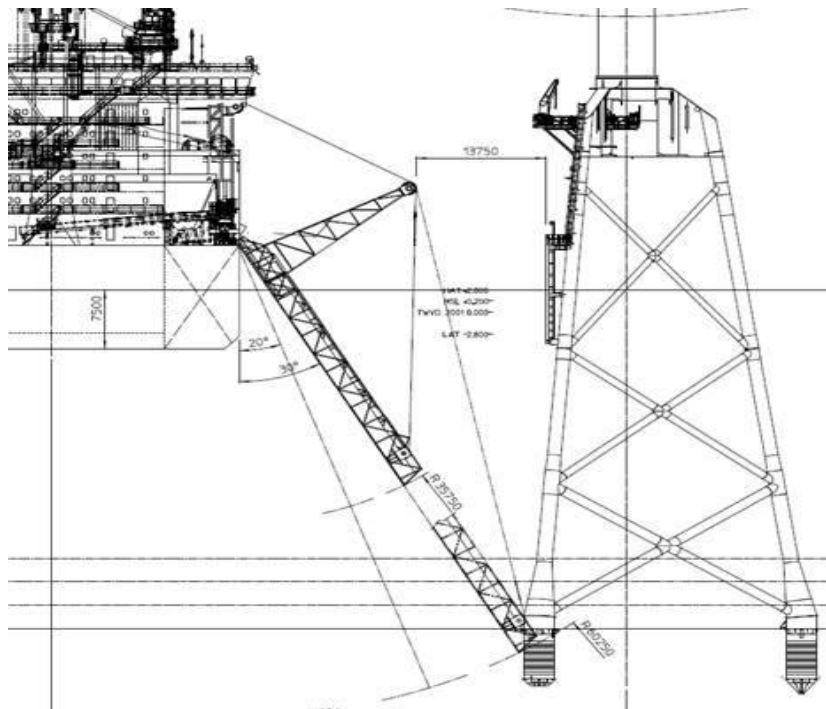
Installation of DP2 Fall-pipe Jacket
